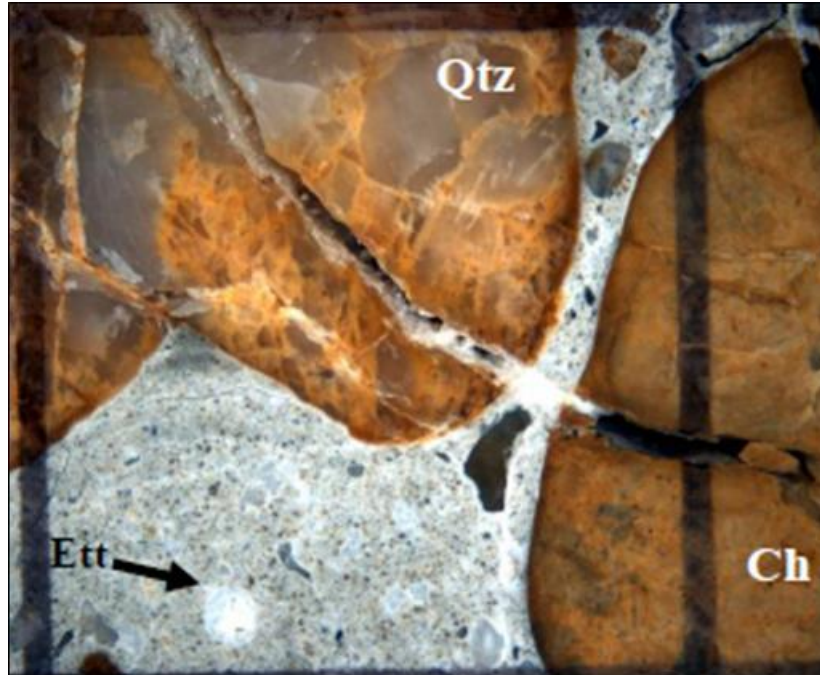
Example of severe cracking in polished section of core 2A-South
